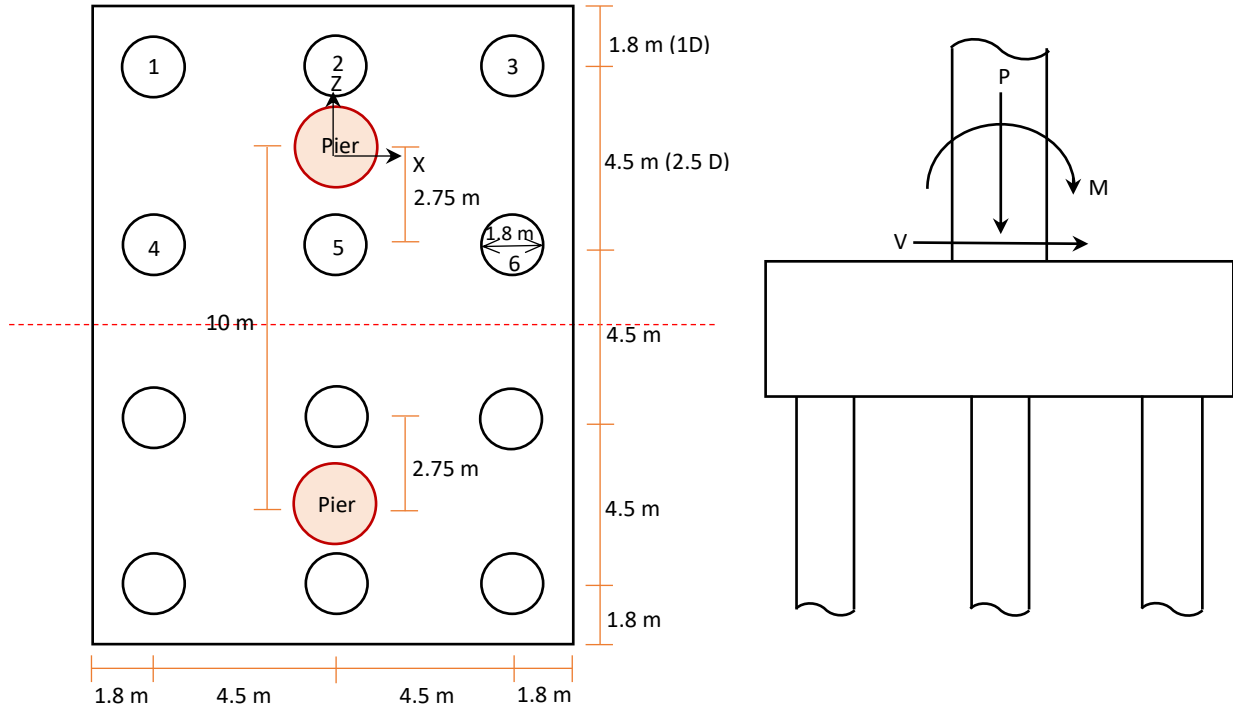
Arrangement of piles and pier columns in the pile cap of pier P5.
